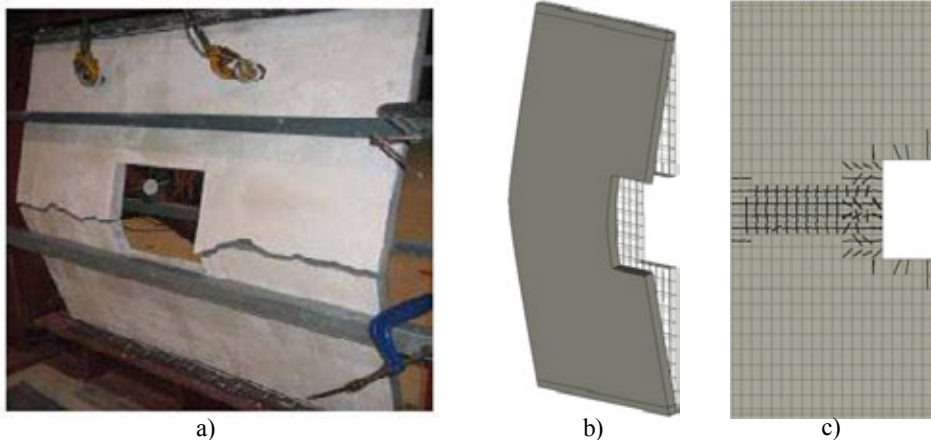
Crack pattern and failure mode for one-way walls: a) experimental [12]; b) deformed shape - FEM; c) crack pattern - FEM
